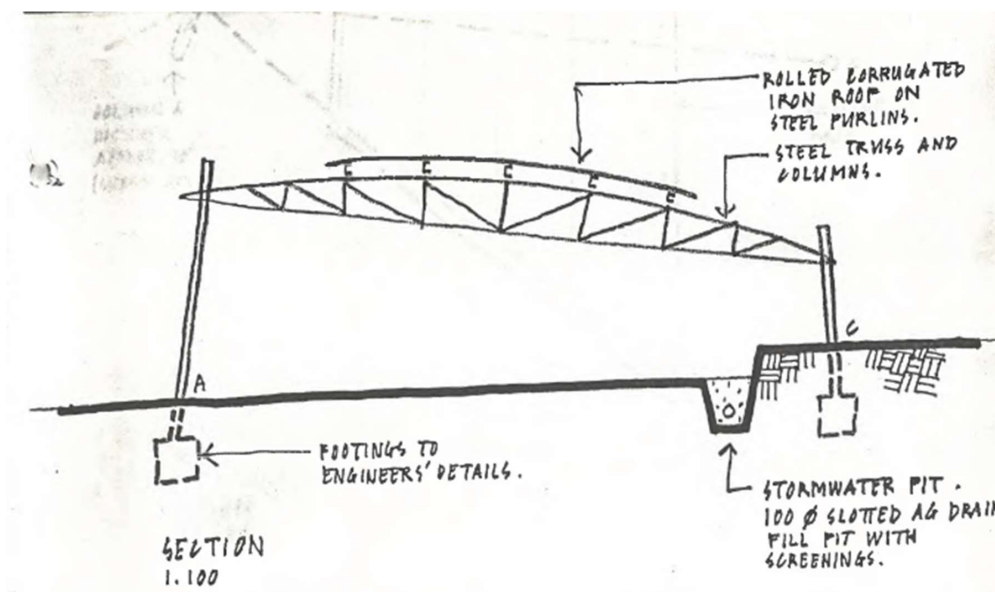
Plans for car port at the Choong House by architects Wood Marsh. (Source: BP, undated)
